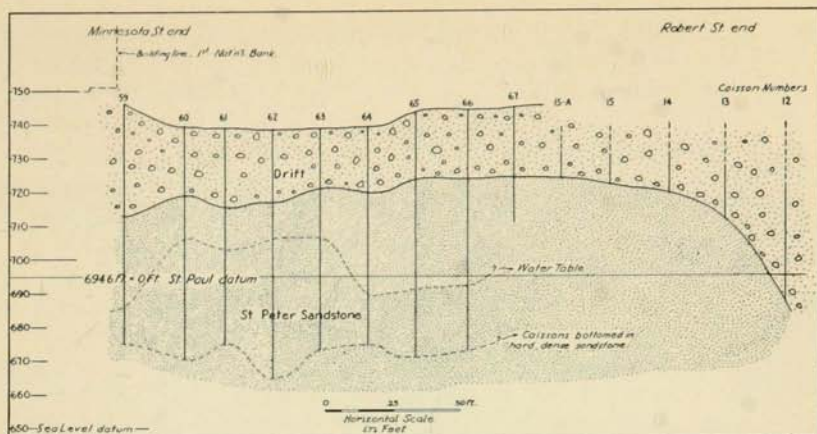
Cross section showing the foundation conditions at the First National Bank Building in St. Paul, taken on an east-west line 30 feet north of the south line of the building. View looking north.
